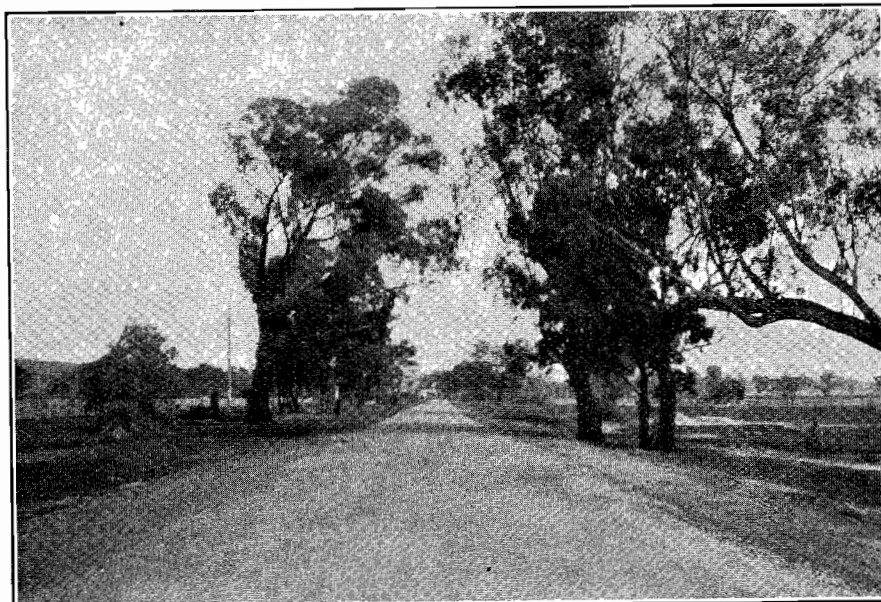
Hume Highway. Completed mixed-in-place Pavement north of Chiltern Railway Crossing.
